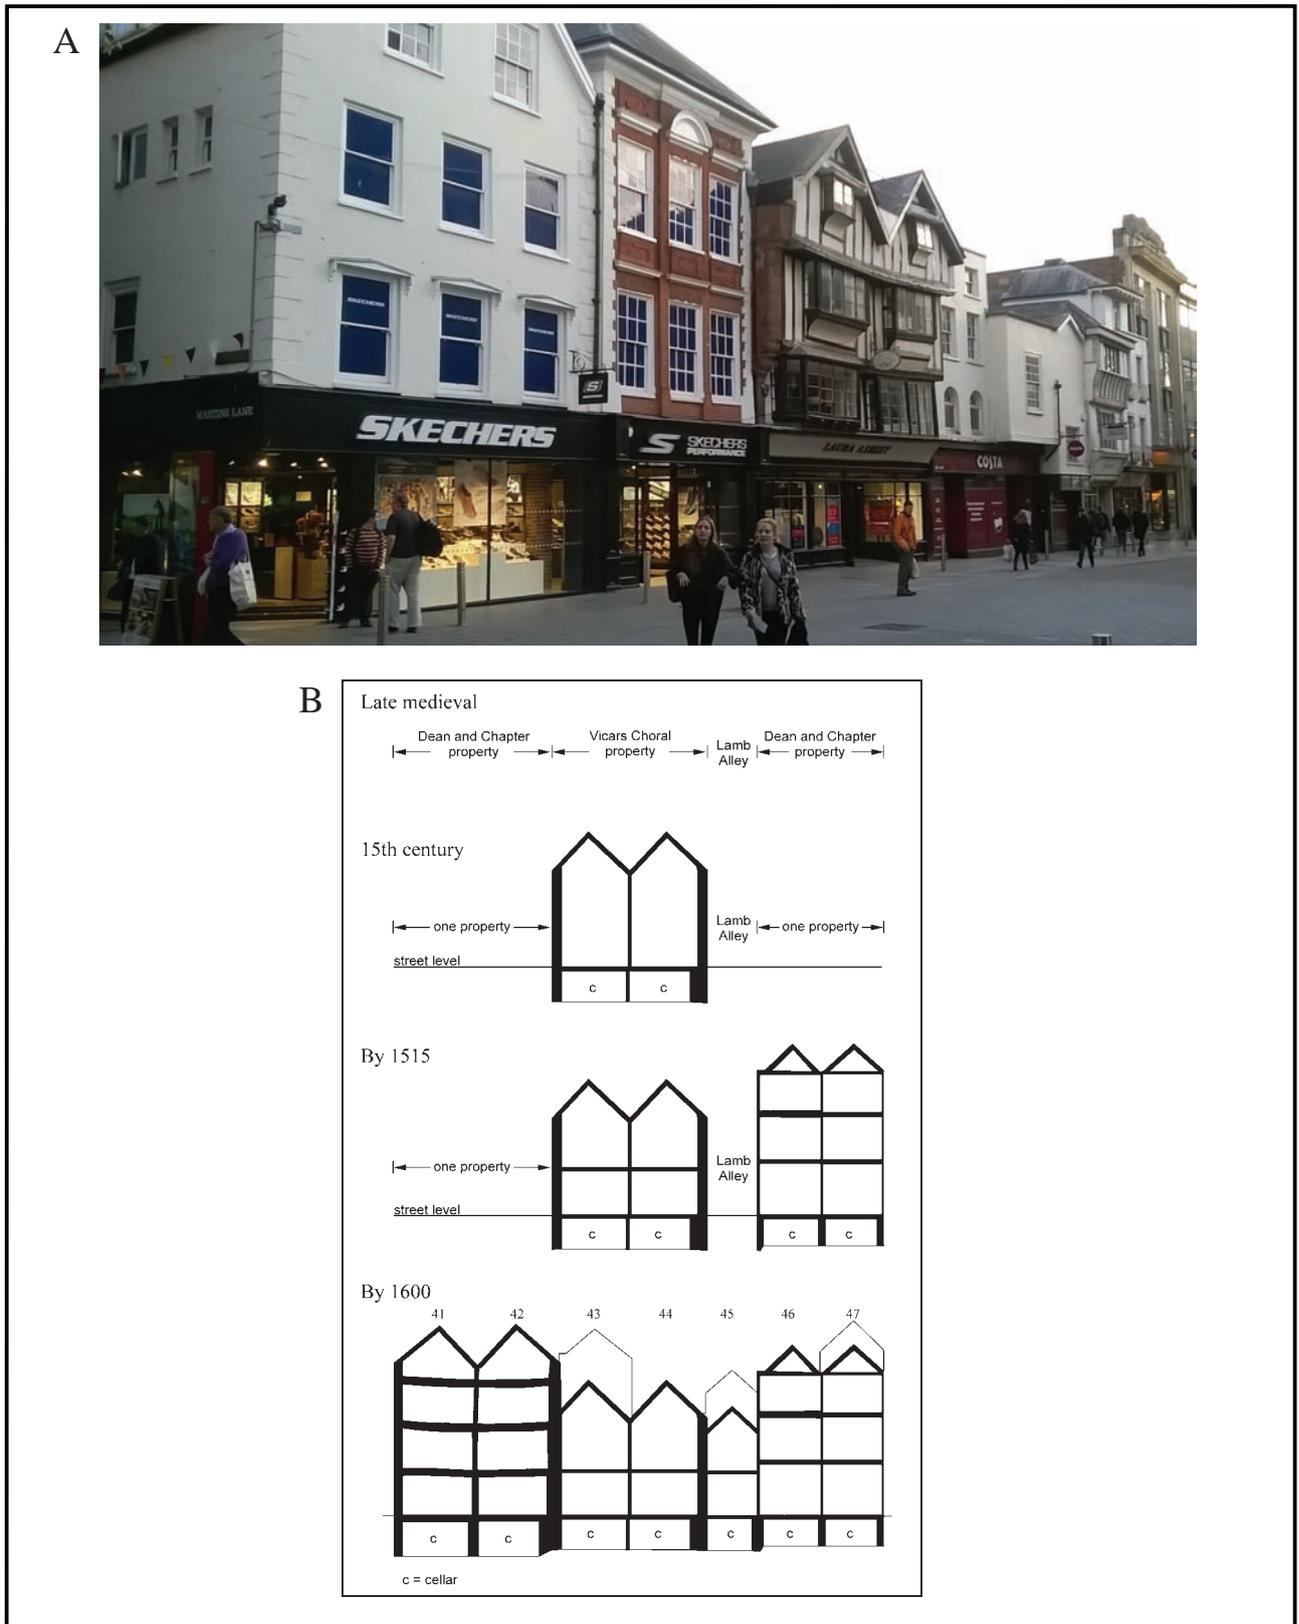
(A) 39–47 High Street (© John Allan). (B) Reconstructed sections through Nos 41–7 High Street, c. 1400–1600 (from Parker and Allan 2015).
